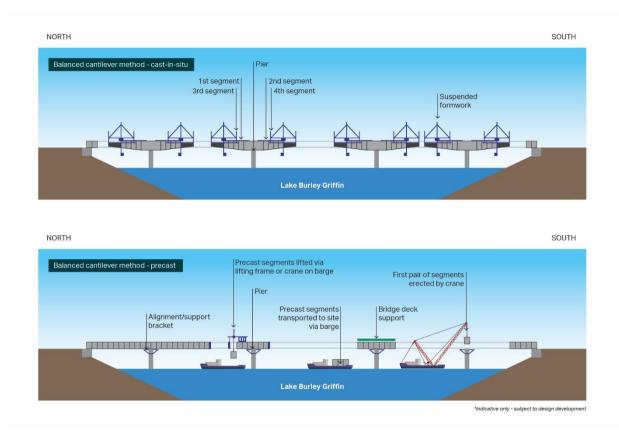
Commonwealth Avenue light rail bridge - balanced cantilever method
